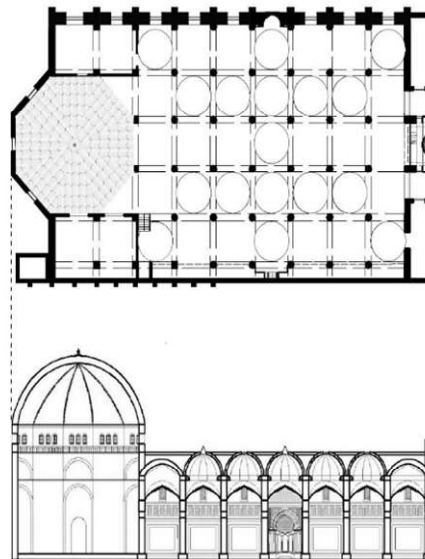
Plan and section of Hassan Bey Mosque (source: author,2025)
